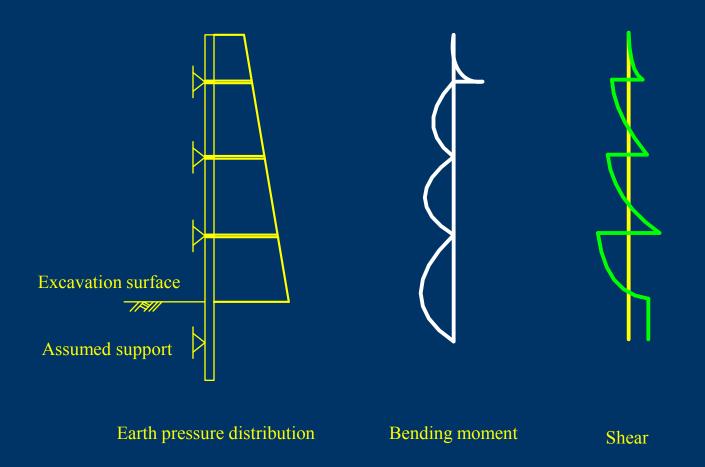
One-stage loading simply supported beam method (the simply supported beam model)
